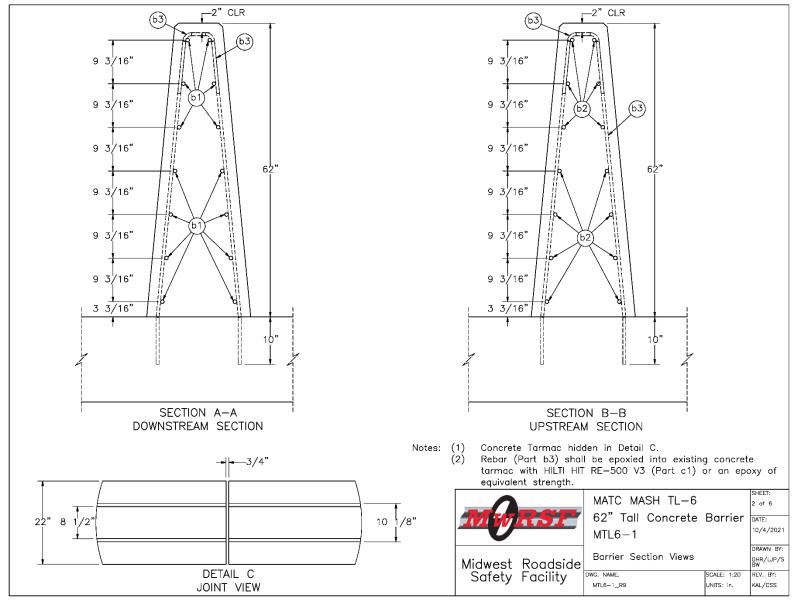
Barrier Section Views, Test No. MTL6 1
